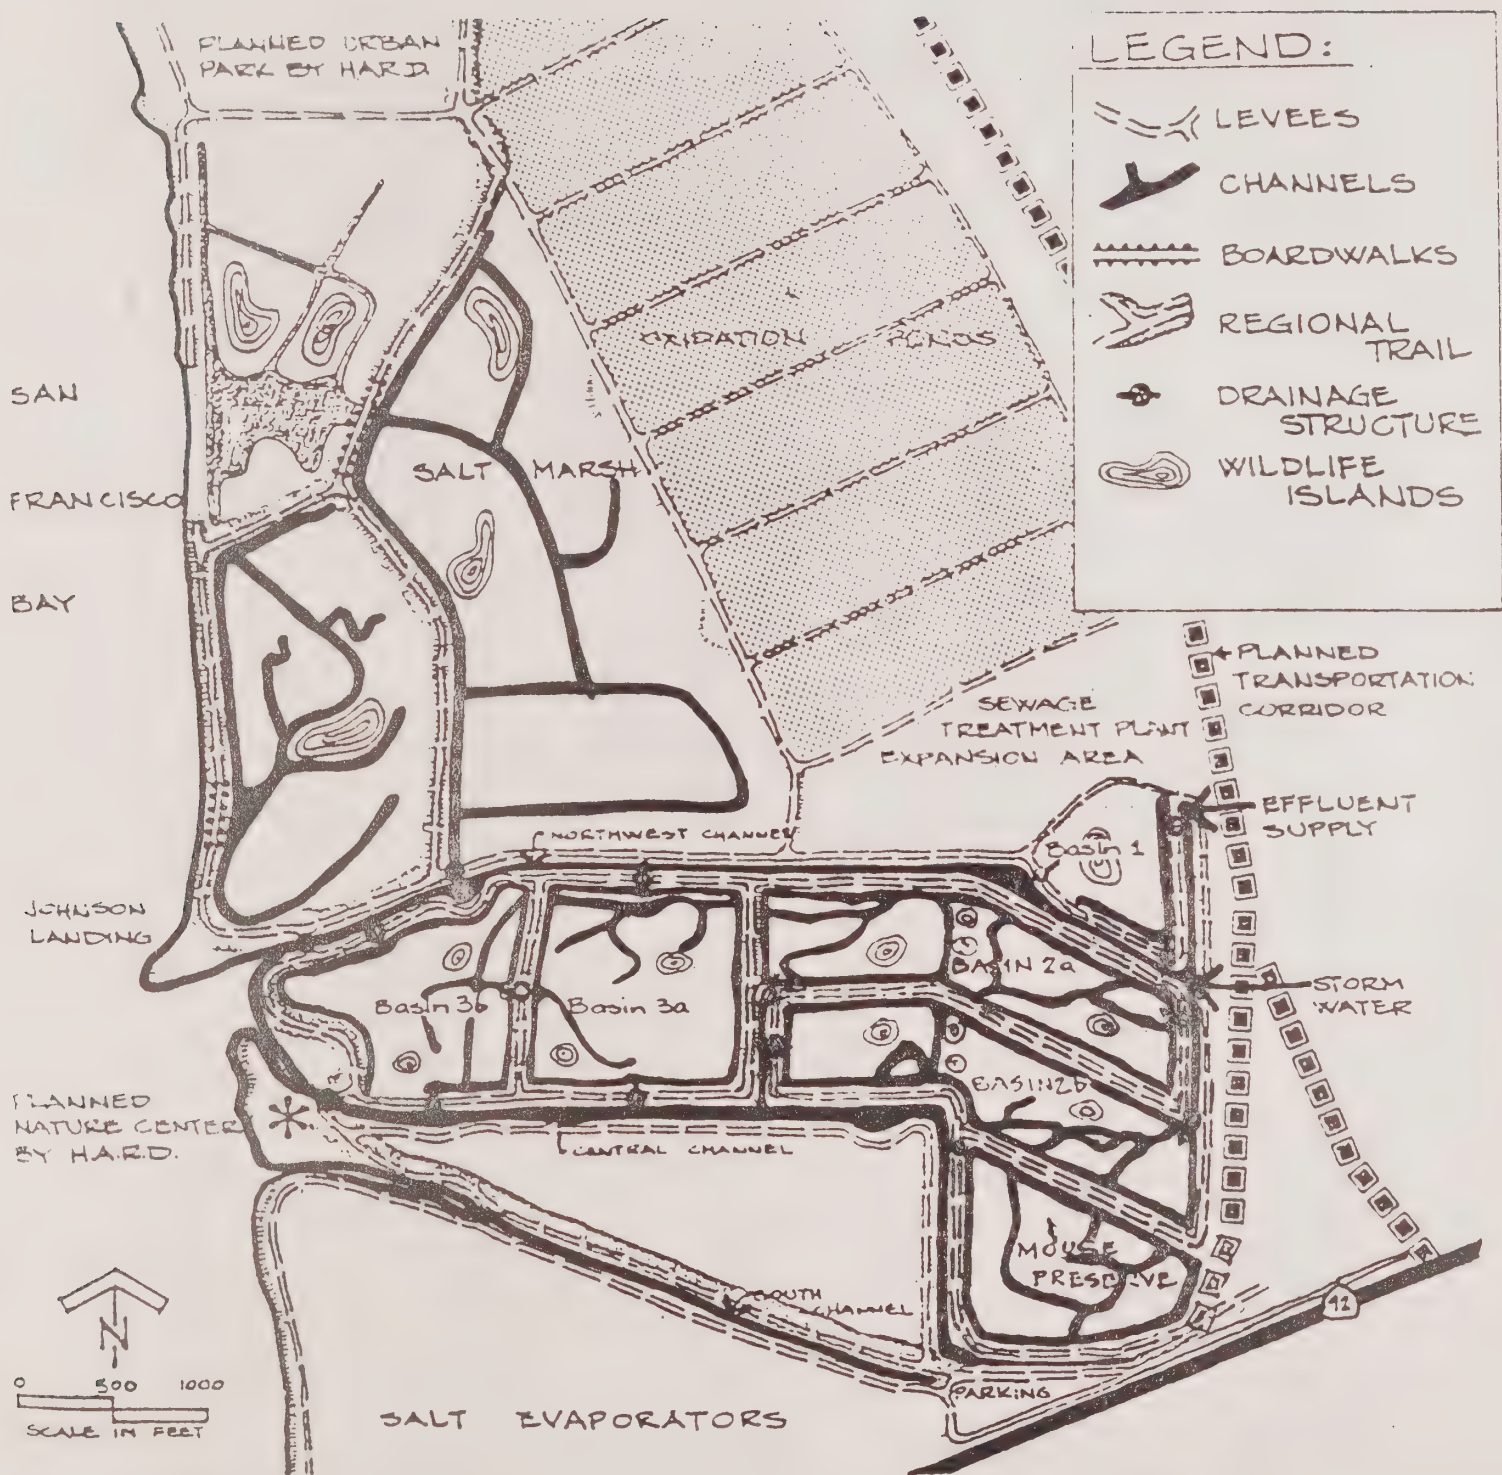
PROPOSED SITE DEVELOPMENT PLANS,
